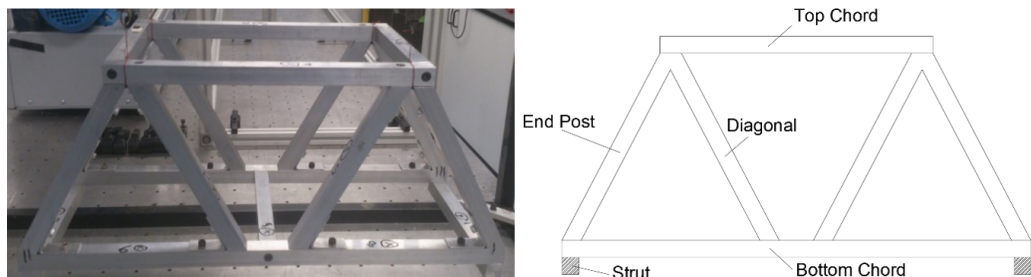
(a) Laboratory Testing Structure (Truss Bridge) hanged by four springs (free-free support) and (b) designation of truss members.
